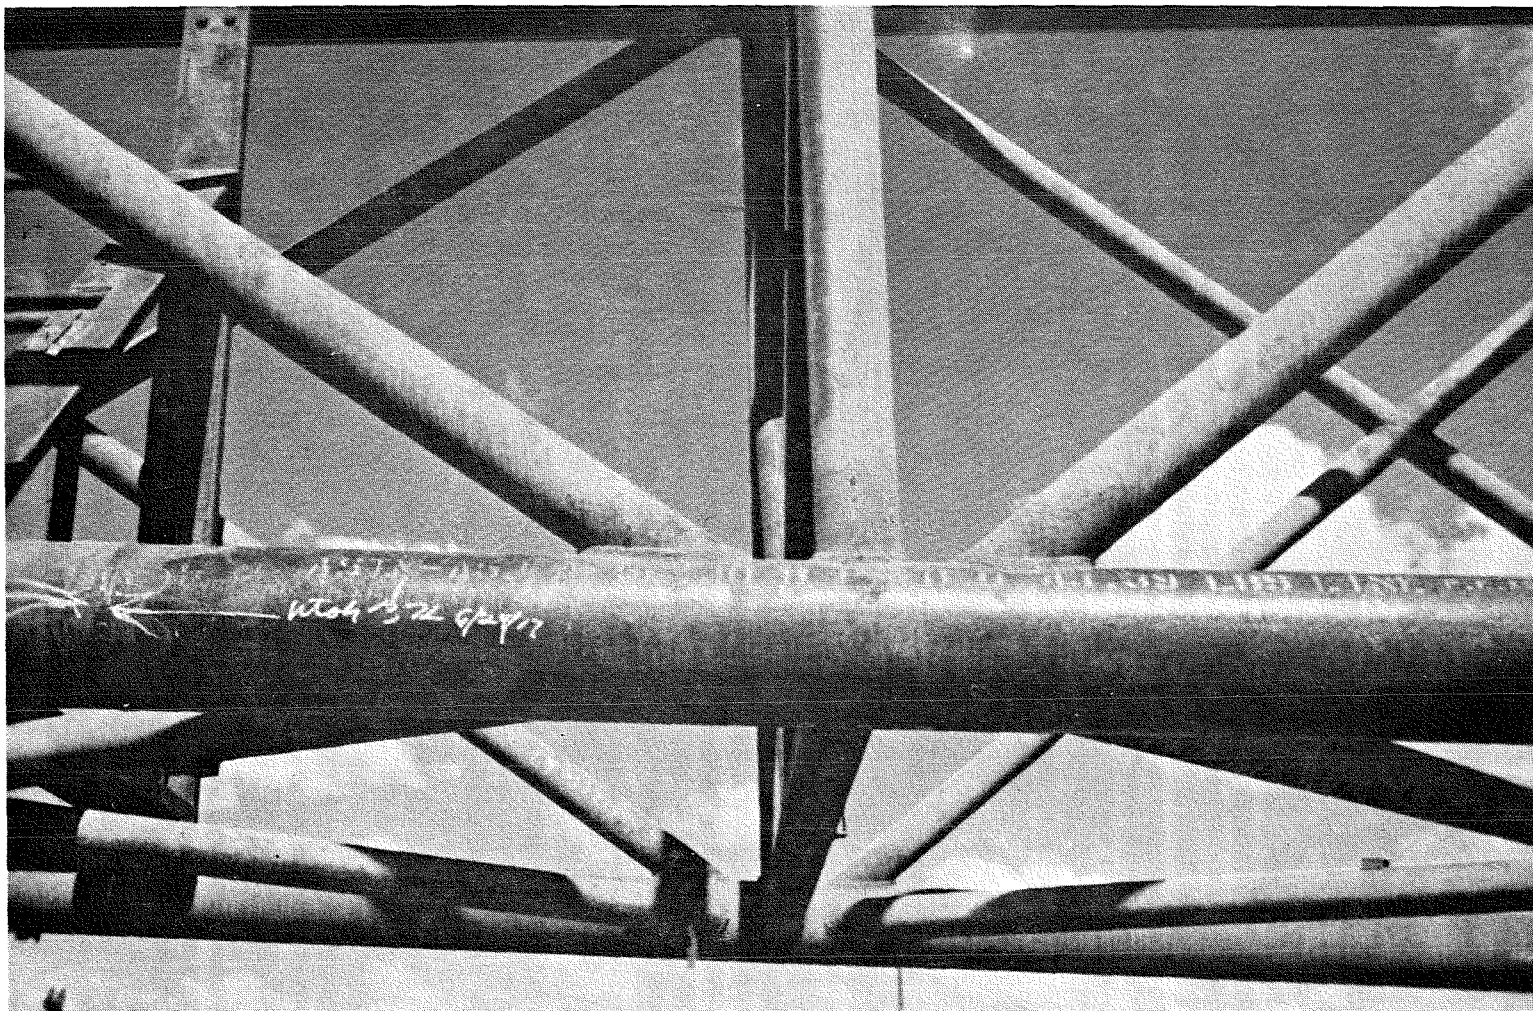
MOD-0A Tower Round Pipes and Welded Joints
